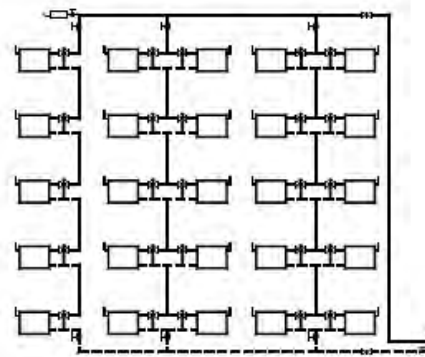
Sketch drawing of operation of pipe circuit heating system
